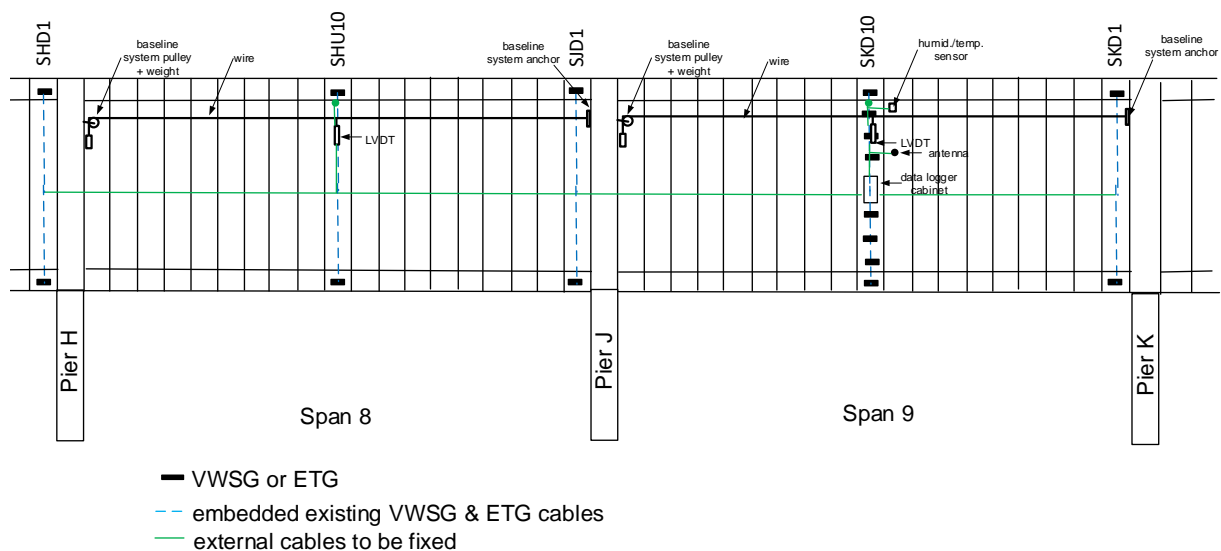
The elevation view of spans 8 and 9 of the Newmarket Viaduct [151].
